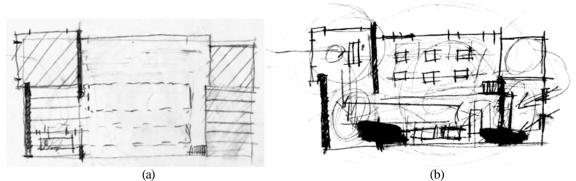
(a) Plan of different space arrangement. (b) trace on top of the plan and added furniture (table and counter), steps to architect's office, lighting and circulation.
